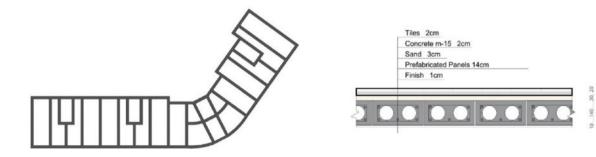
Structural plan of 12C building (left) and slab section (right)
